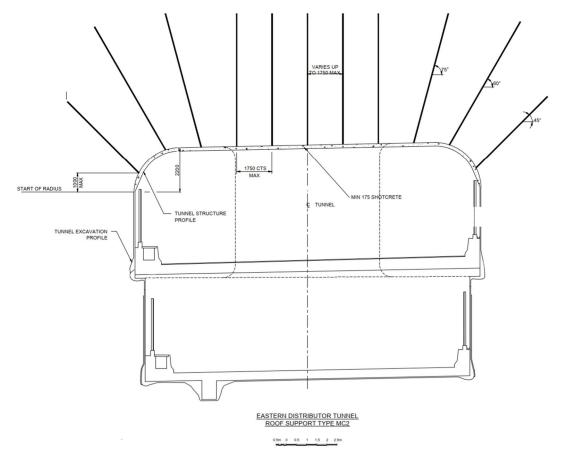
The ED tunnel typical cross-section showing - geometry, roof support and tunnel liner
